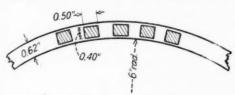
Segment of a Ring Section of a 12-in. Pipe.
